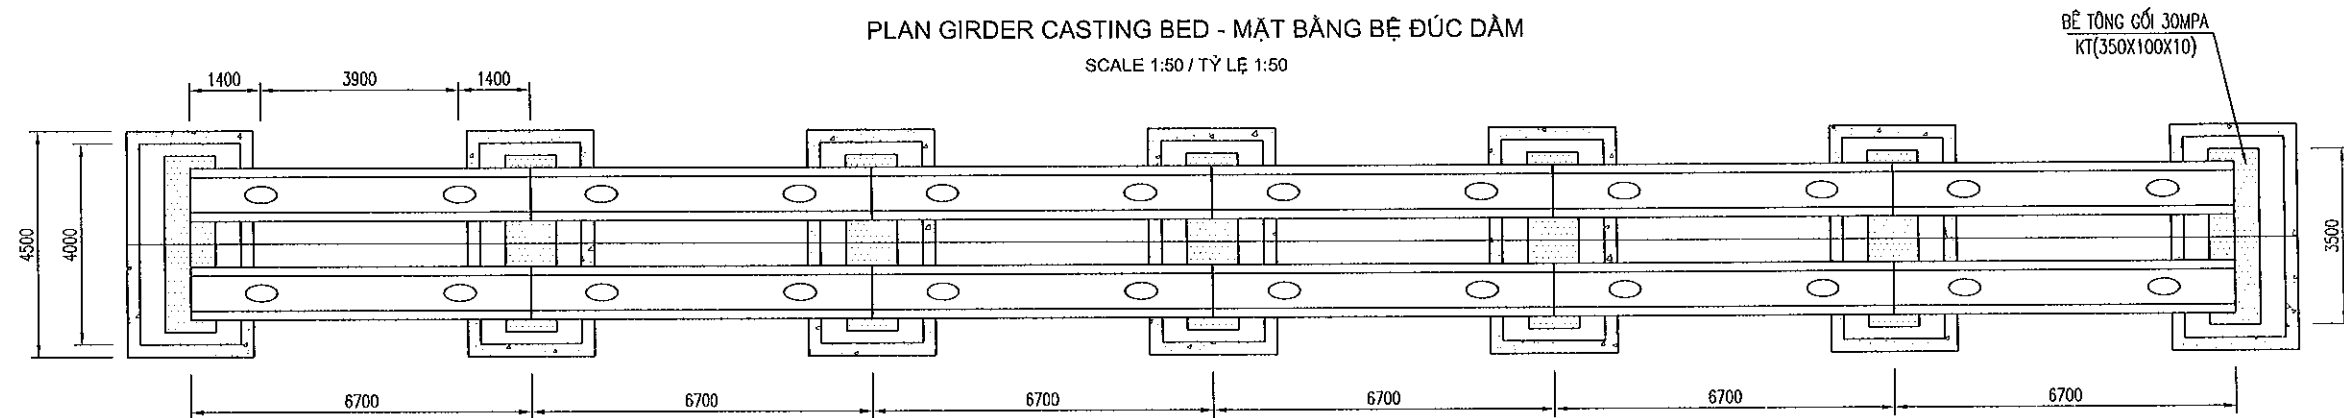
# DETAIL OF SUPER-T GIRDER CASTING BED - CHI TIẾT BỆ ĐÚC DẦM SUPER-T
